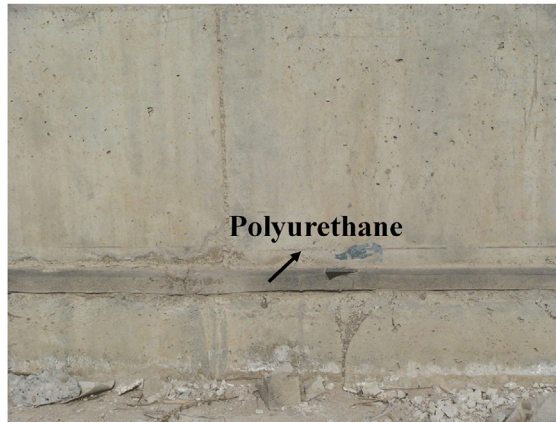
Polyurethane layer positioned between concrete slab and concrete base.
